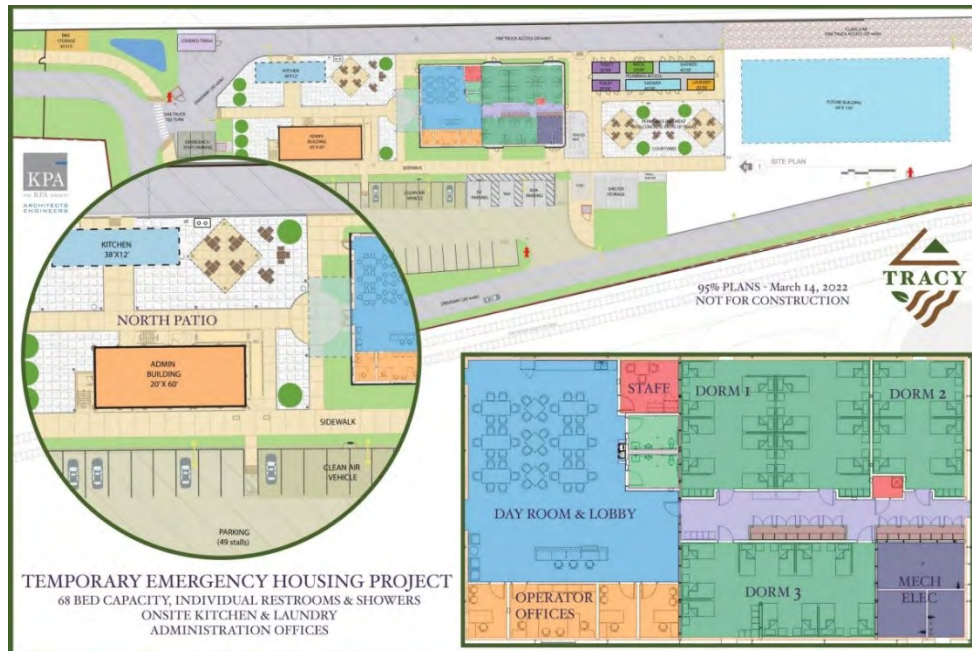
Tracy Shelter Site Plan and Sprung Structure currently in development (by: City of Tracy)
